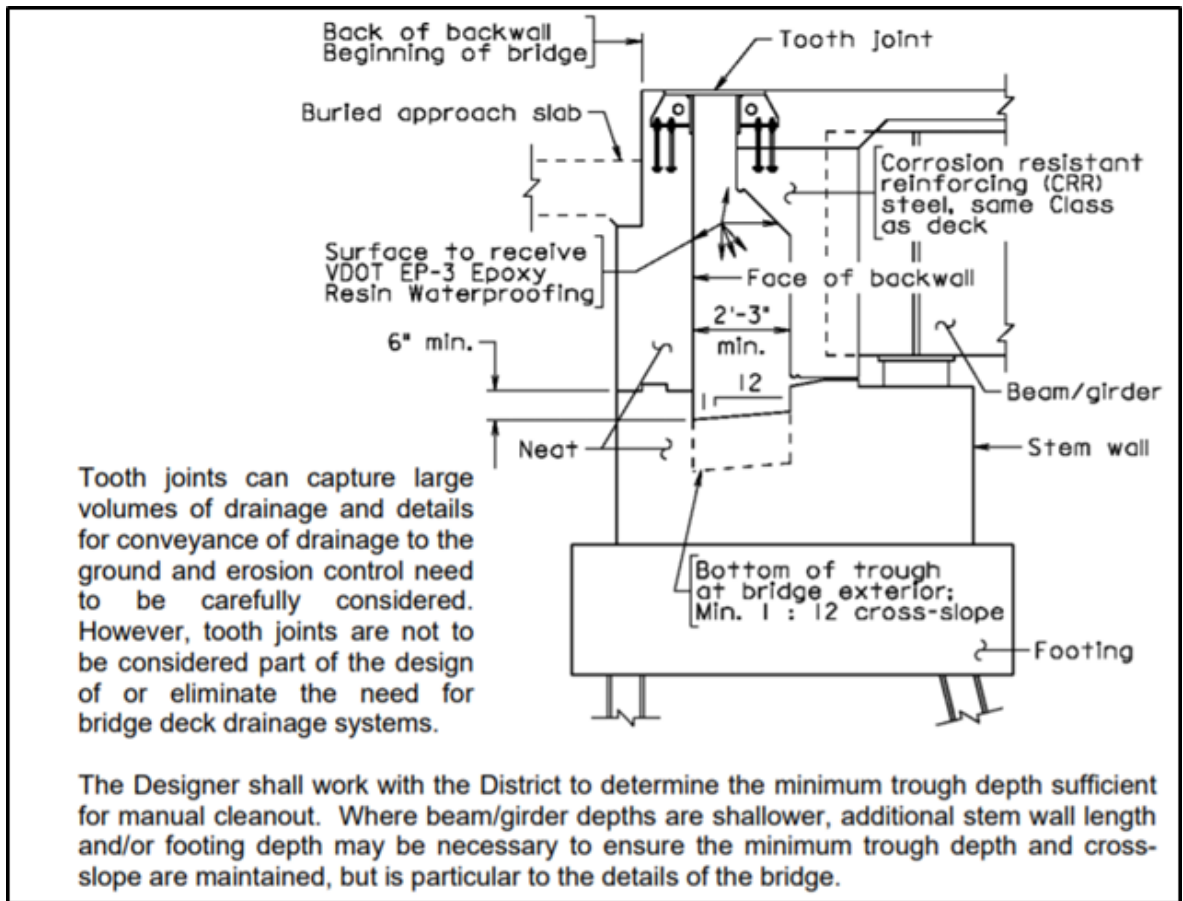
Example Detail of Virginia Abutment (VDOT Manual of the Structure and Bridge Division p.17.01-4)
